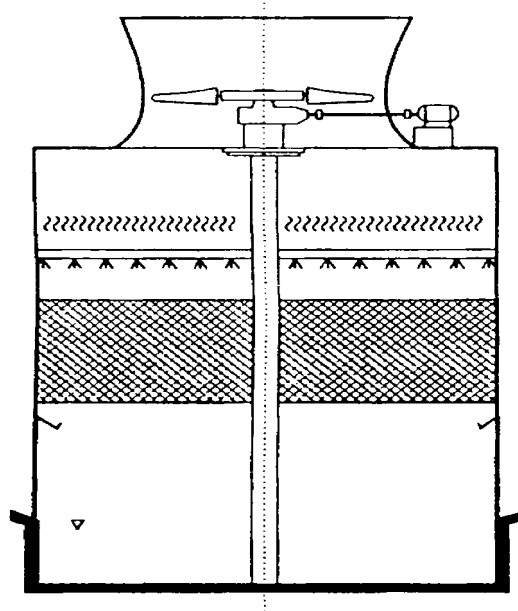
Mechanical draught cooling tower (suction fans, cell construction)
